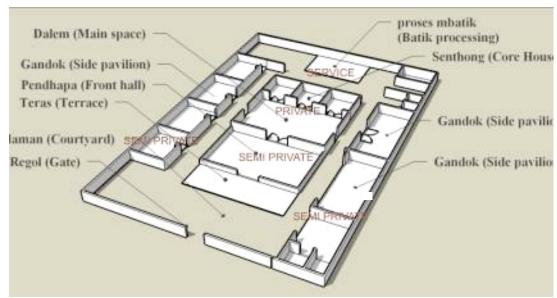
Sample [B] of the Javanese house: Original plan.
